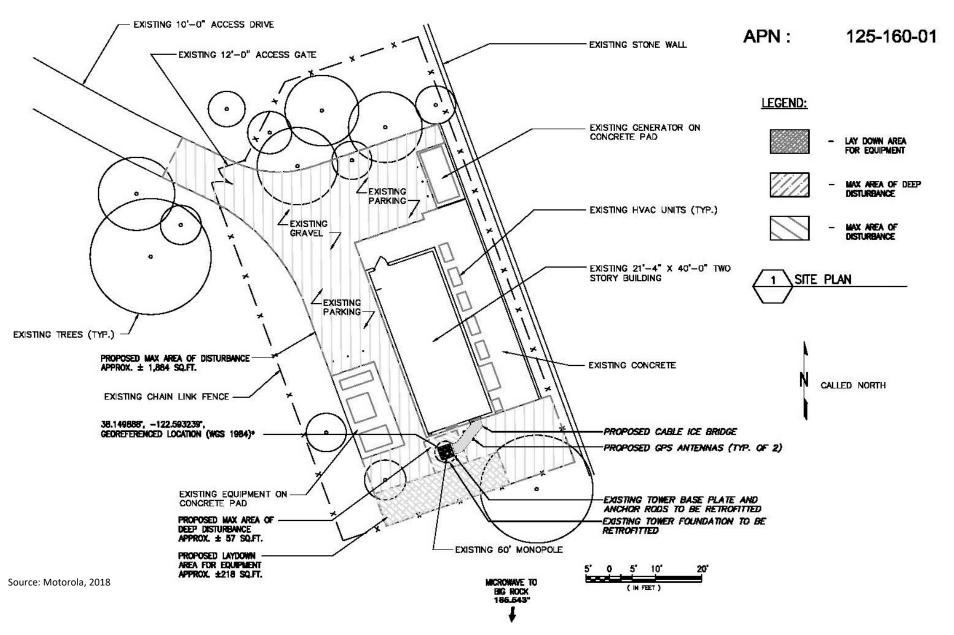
Site 25 - Mt. Burdell OTA Site Plan
